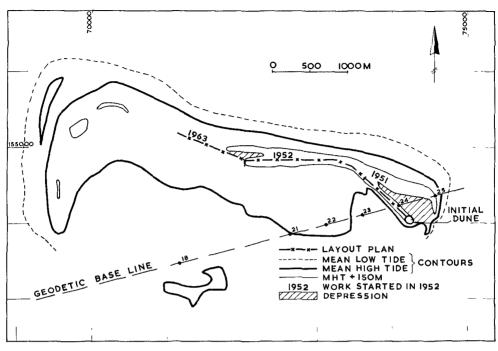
SITUATION OF ROTTUMERPLAAT WITH LAYOUT PLAN OF THE DRIFT- SAND DYKE AND CONTOURS
